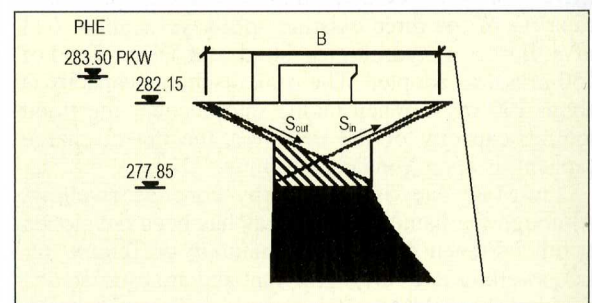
Trapezoidal PKW: A-A cross section, outlet alveolus.
